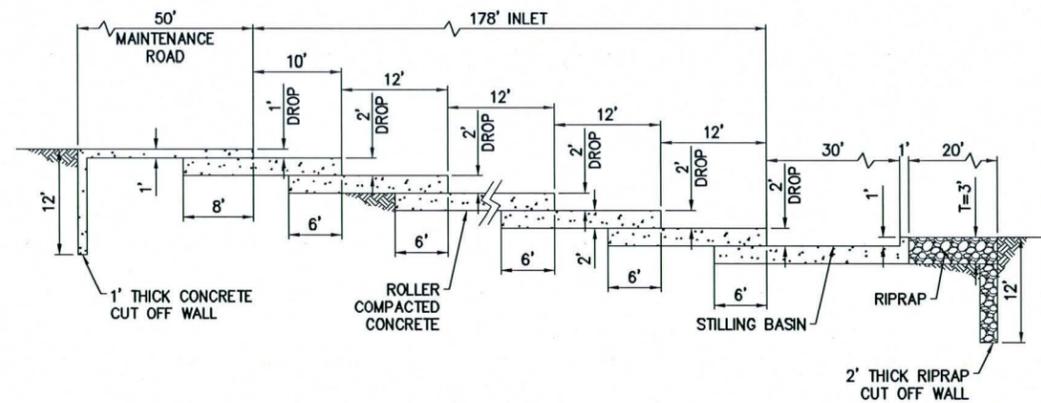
RECOMMENDED ALTERNATIVE CONCEPT PLAN
